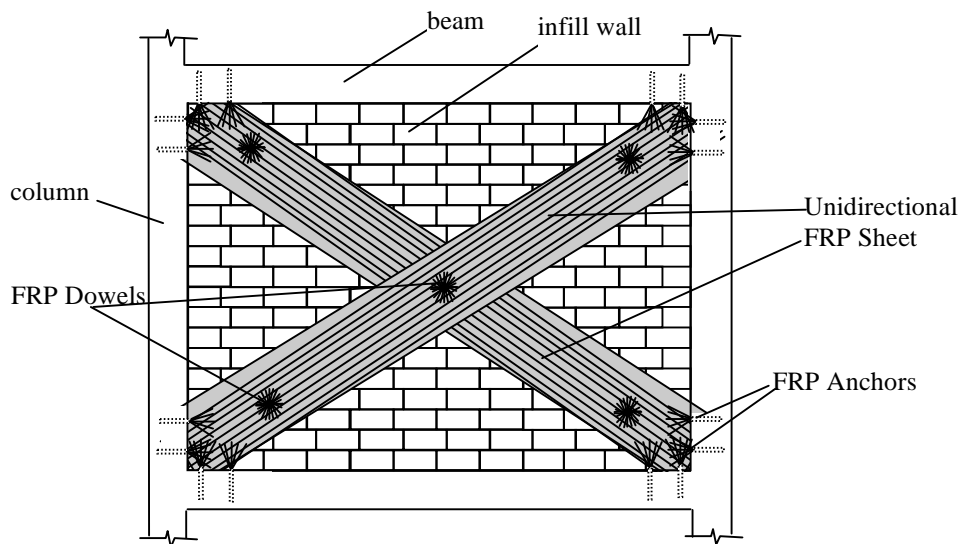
FRP strengthening method for reinforced concrete frames with infill walls
